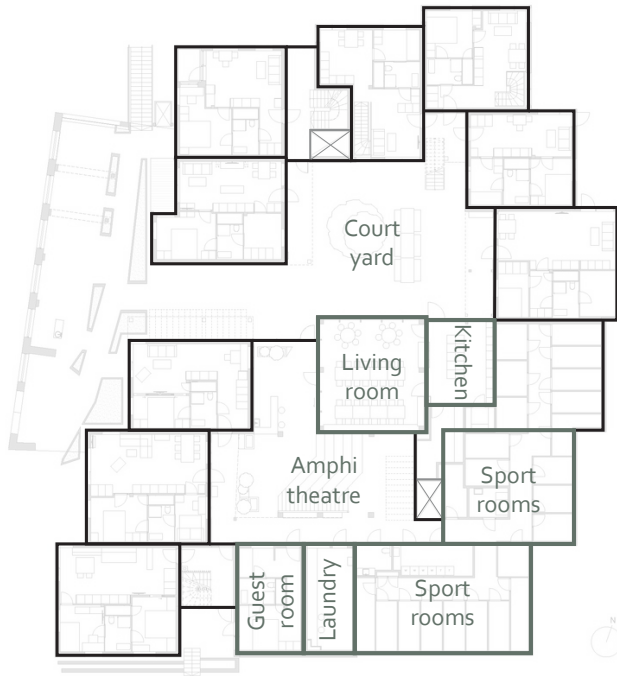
Amphitheatre on floorplan (made by author, based on ArchDaily, 2021)
